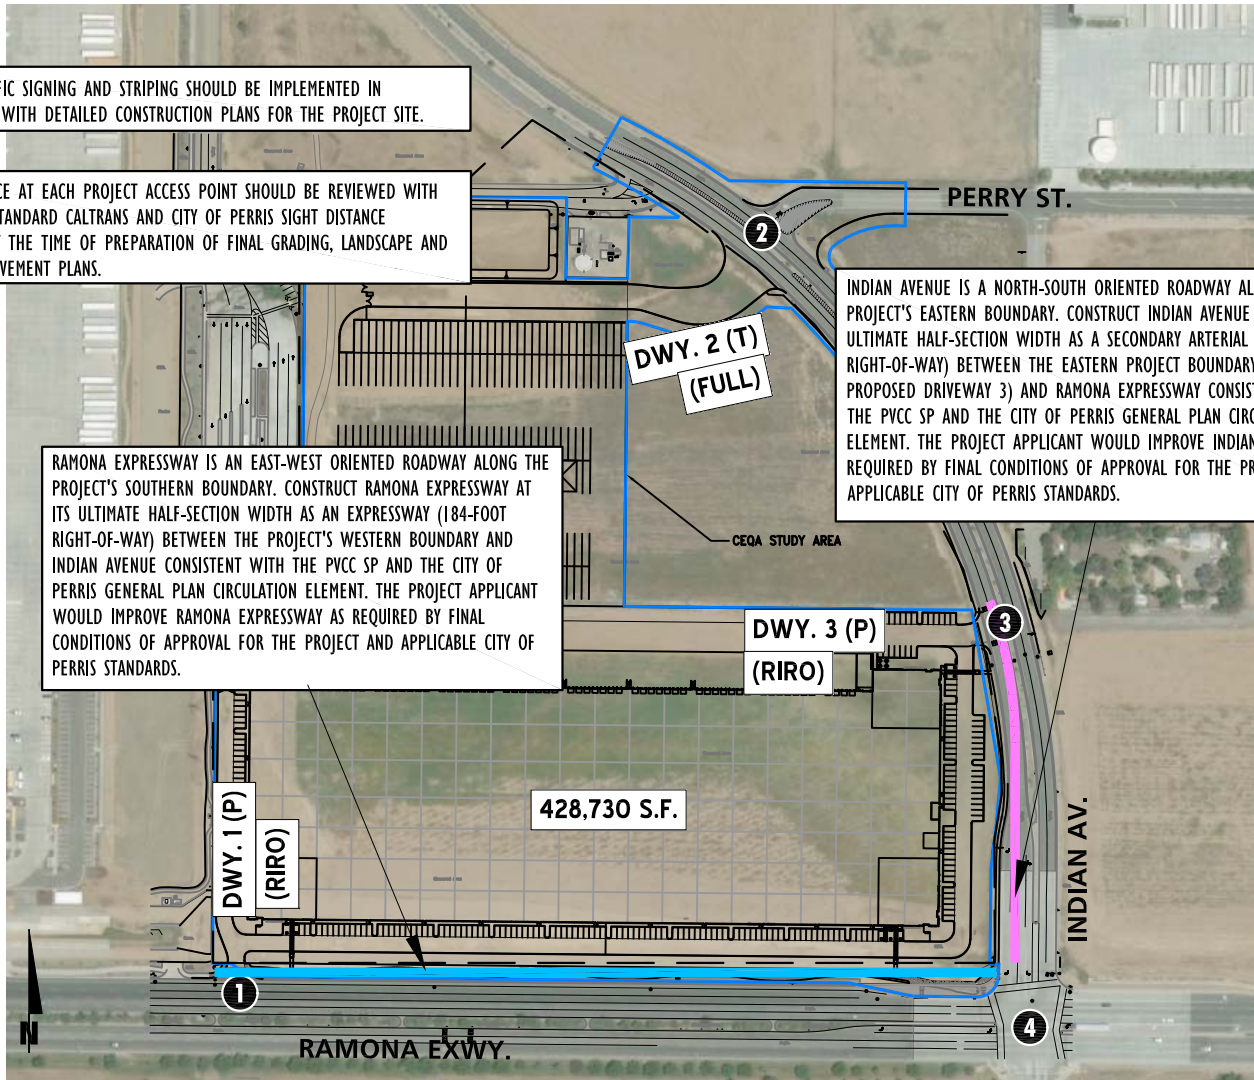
SITE ADJACENT ROADWAY AND SITE ACCESS RECOMMENDATIONS
